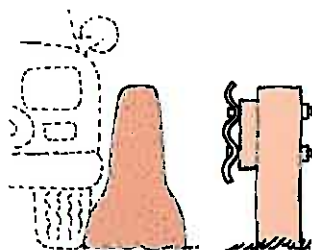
Cross-section view of concrete road divider, and steel road divider. Which design is best for slowing an out-of-control, sideswiping car?
